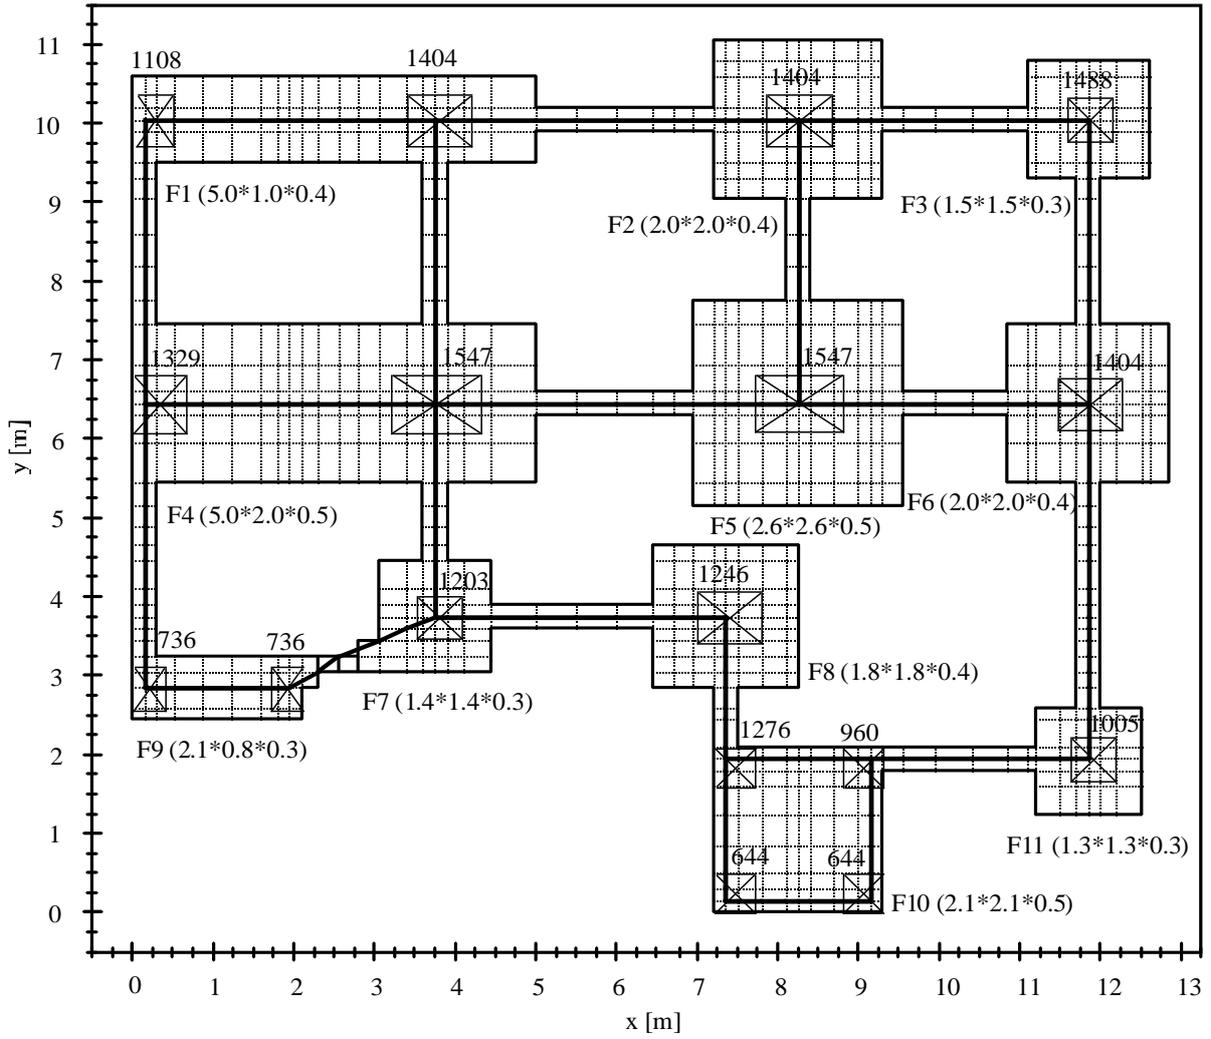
FE-Net of footings with tie beams, loads [kN/m²] and footing dimensions [m]
